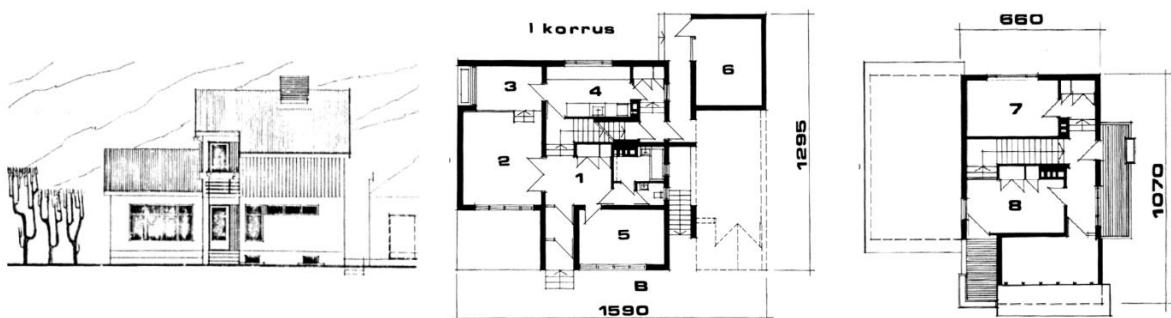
Project 5-11-81, an example of a partly two-floored dwelling from 1981 (left to right: elevation; ground floor; upper floor) (Asszonyi & AmjÄrv, 1981)
